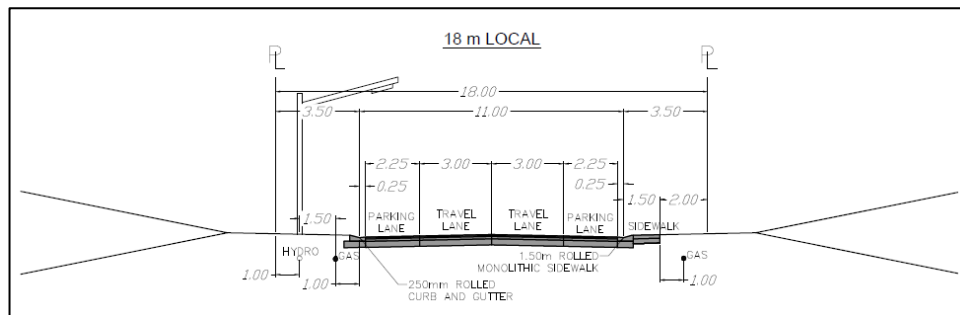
18 m Local Street Sample Cross Section (source: Arcadis IBI Group FSR)
